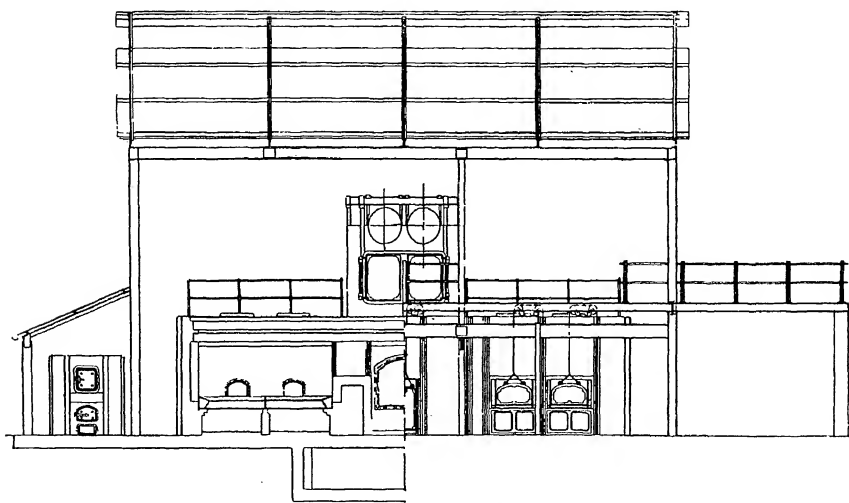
Meldrum's Top-Fed Destructor at Johannesburg (Burghersdorp). Part elevation and part section of one unit.
